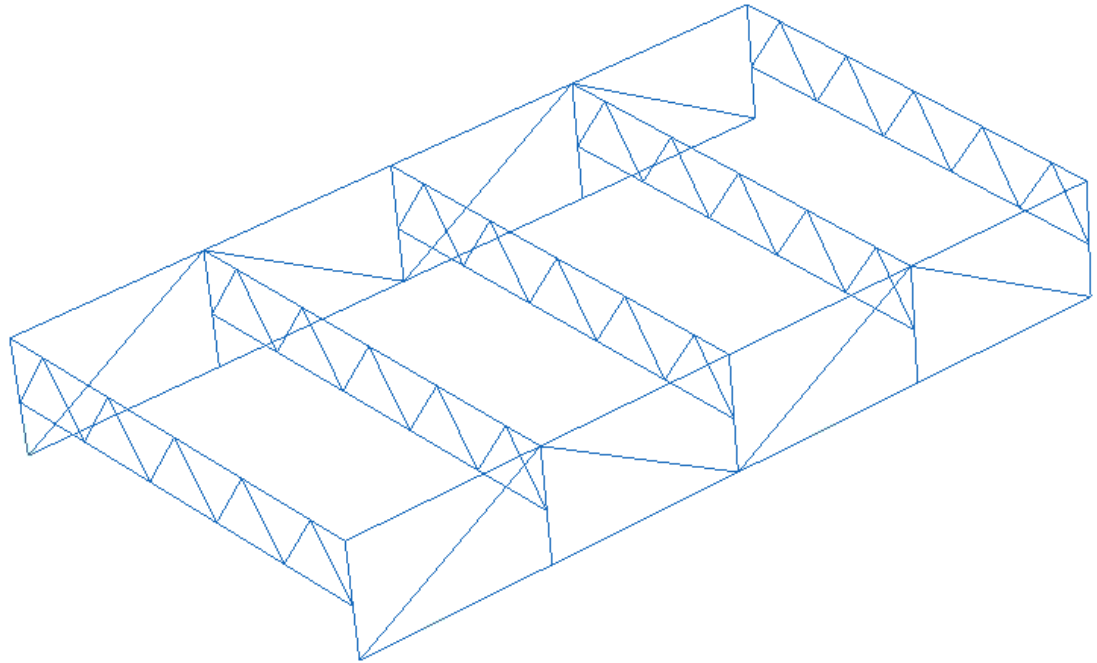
Illustration. Support truss system with five transverse trusses and two longitudinal trusses.
